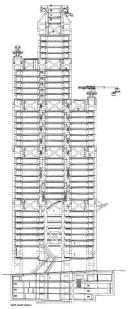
One of the sections of HSBC showing three individual towers A sheltered space is created below the public plaza where at weekends it is used by the public as a picnic area (Fig. 22). Within the context of the building, sunlight carries importance as well, which is reflected down through the atrium to the public plaza below by a computer-controlled and mirrored "sun-scoop".
